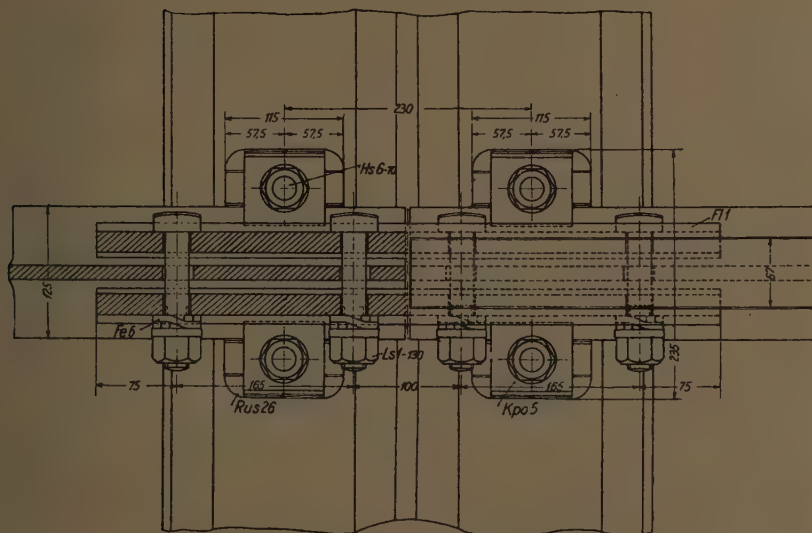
Rail joint with steel sleepers. — Plan.
